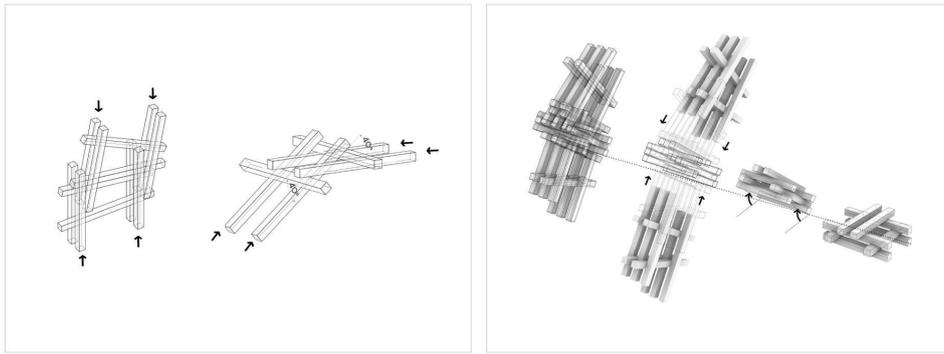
(a)Linear-component assembly: systems in which the base plane of the robotic component fabrication establishes a repetitive relationship with the funicular structure geometry; (b)Spatial-component assembly: systems in which the base plane of the robotic component fabrication establishes different relationships with its neighbours, and these are independent of the base plane of the robotic fabrication, establishing different rules with regard to the spatial assembly strategies⁹
